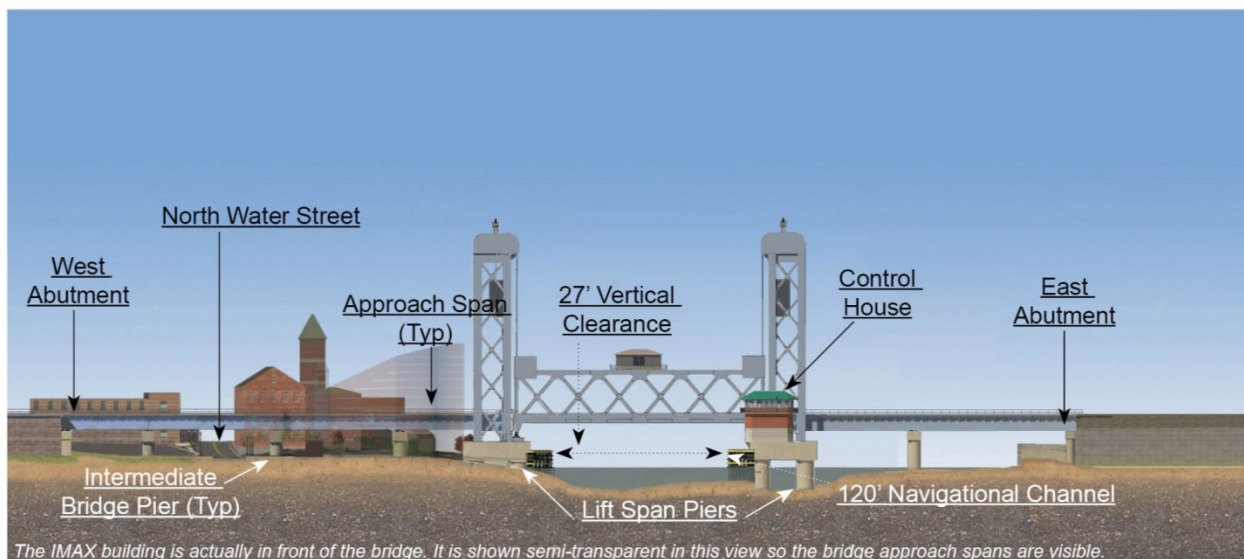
Rendering of the Short Span Vertical Lift Bridge in the Closed Position (Option 8A)
